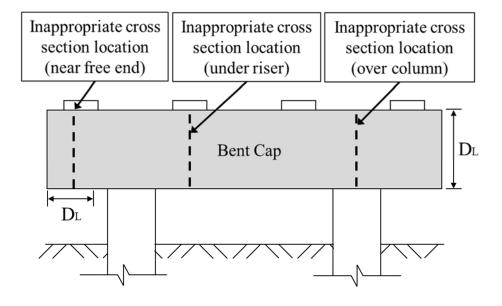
Inappropriate cross section locations on bent cap (n.t.s.)
